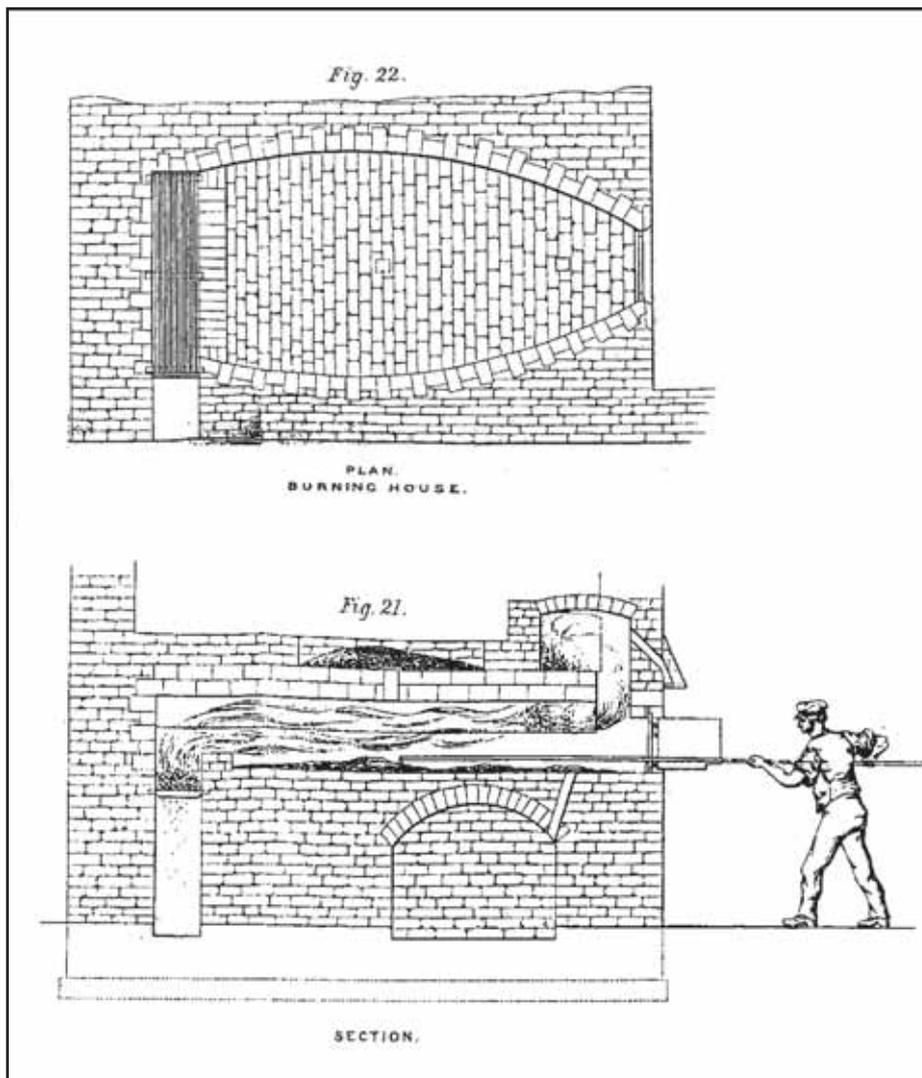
Plan and section drawing of a reverberatory calciner by Henderson 1858.
